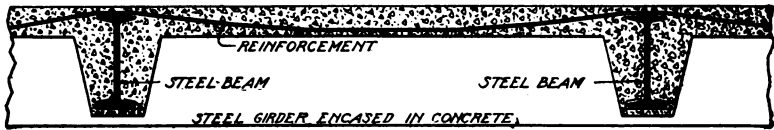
Section of Reinforced Concrete Floor Showing Steel Beams Embedded in Concrete
